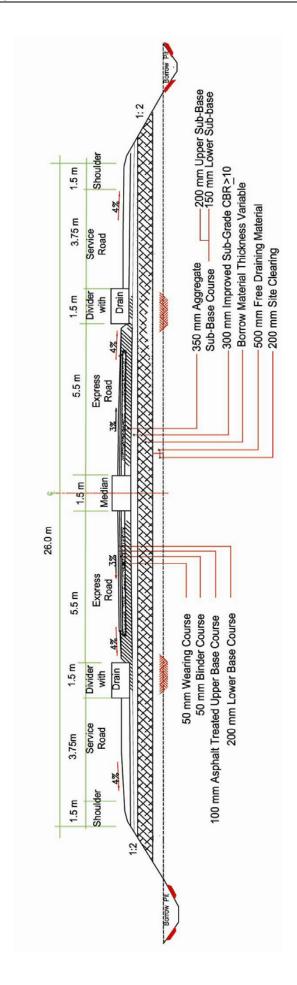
Service Road Design for Rupsha Bridge Approach Road
